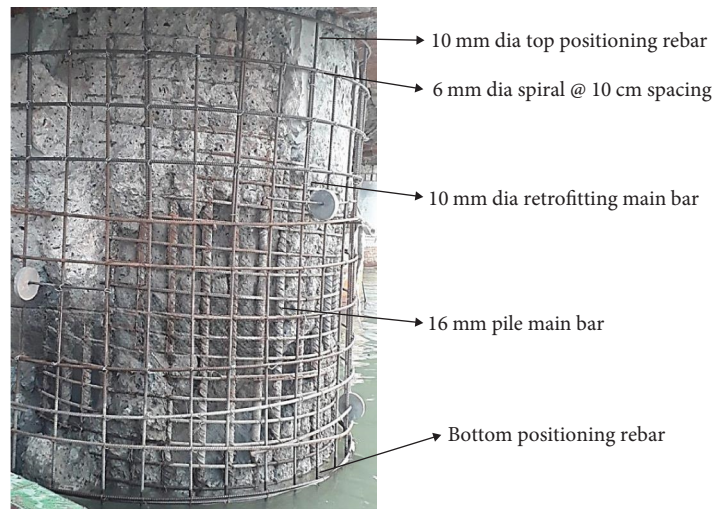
Reinforcement arrangement for retrofitting of the pile.
